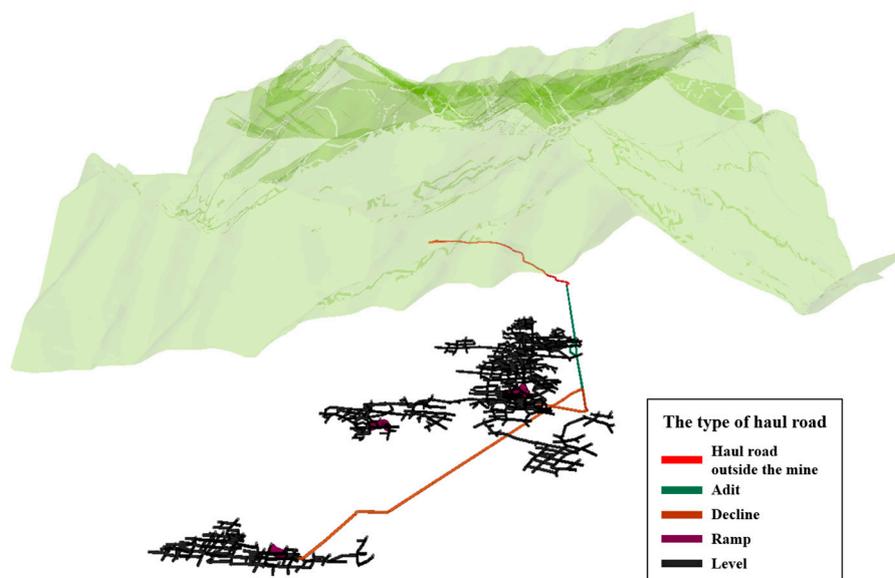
Three-dimensional view of haul roads constructed in the underground mine. Haul roads consist of an adit, declines, ramps, levels, and a haul road outside the mine.
